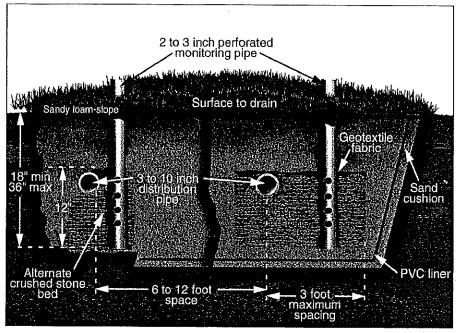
Evapotranspiration beds should be built as shallow as possible, from 18 inches to a maximum of 36 inches deep.
